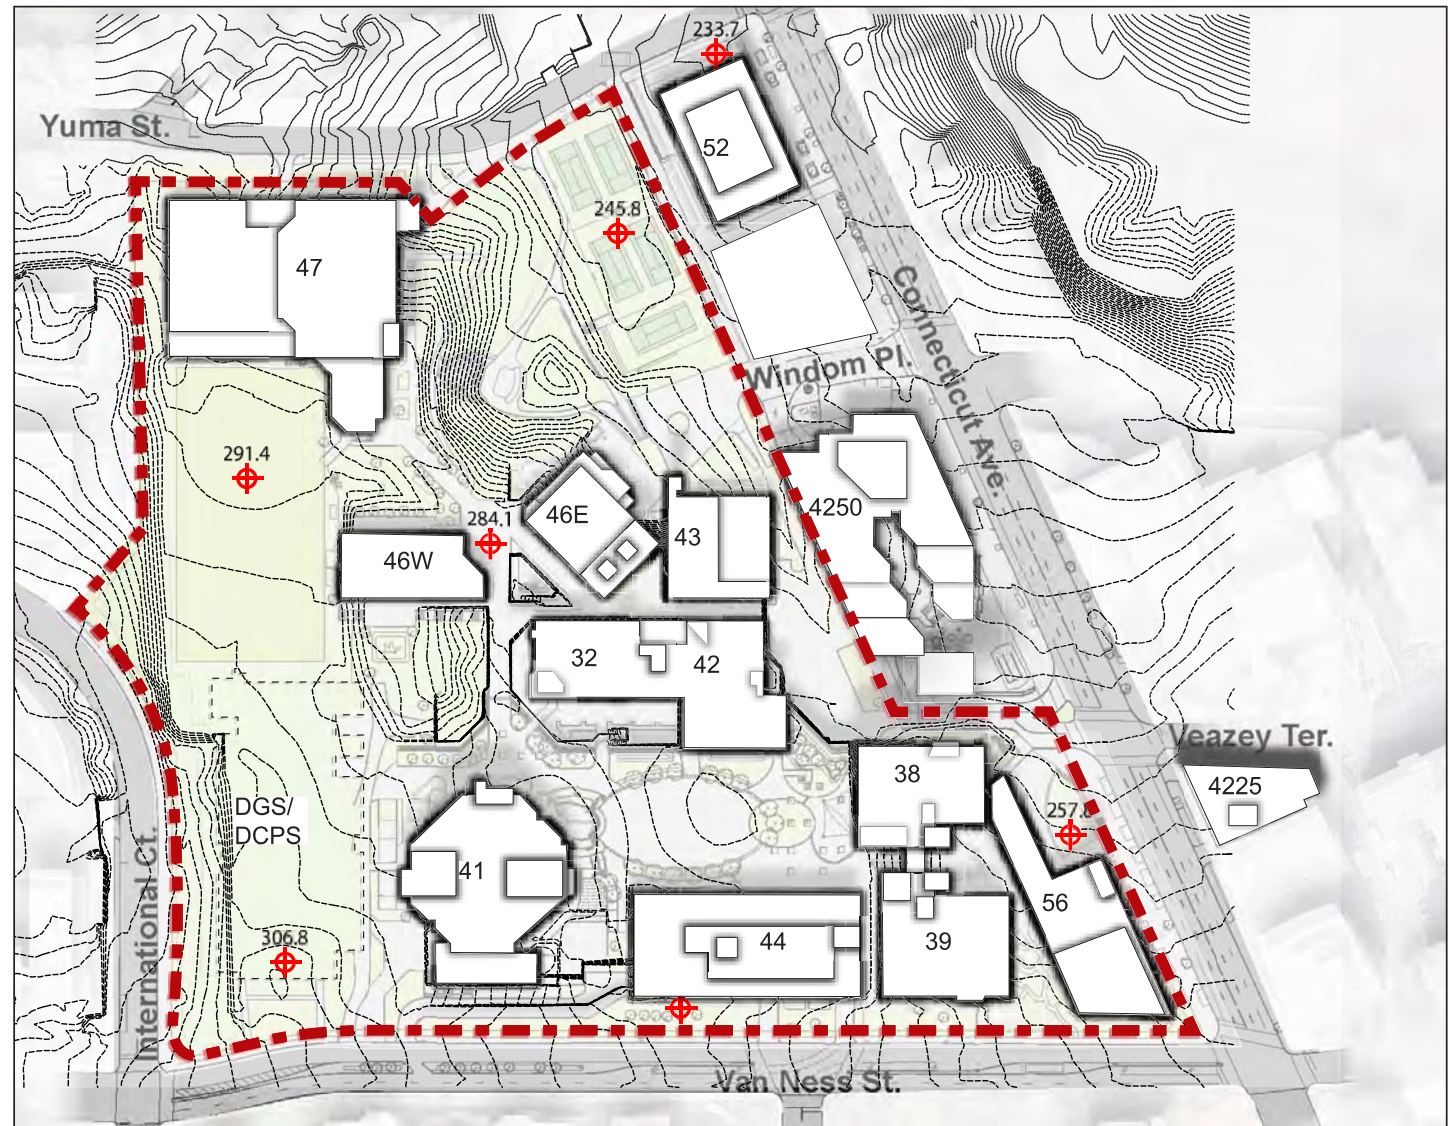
EXISTING CAMPUS BUILDING HEIGHTS
